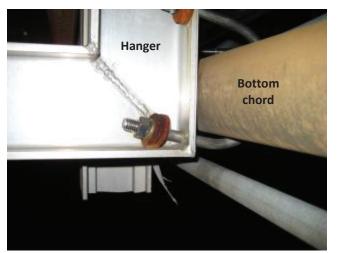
Oversized U-bolts with dissimilar metals (stainless steel U-bolt with mild steel washers) and excess washers at hanger to chord connection
